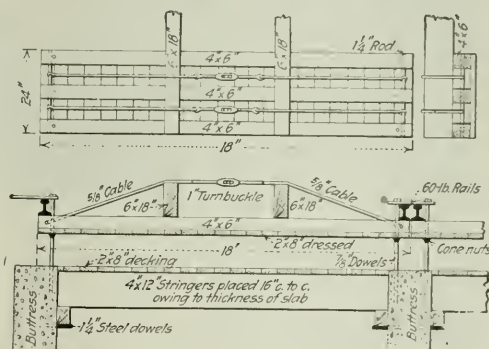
DETAILS OF DECK SLAB FACE FORM PANELS
